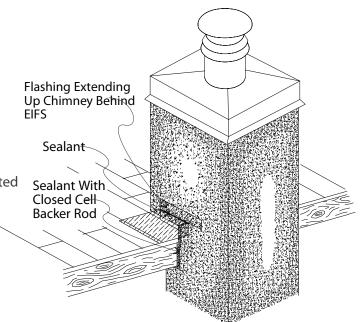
CHIMNEY WITH EIFS INSTALLED
